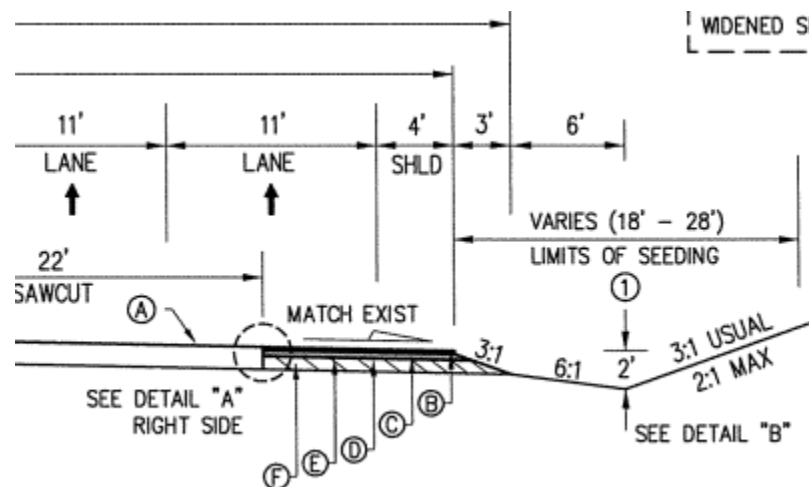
Ditch Depth Shown in Proposed Typical Section.
